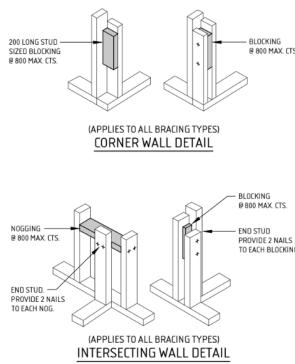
TYPICAL WALL JUNCTIONS
